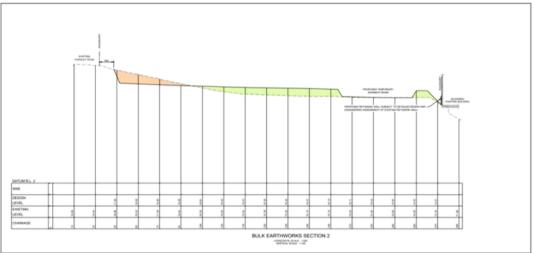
Site Section 2 (See Figure 5) Source: Craig & Rhodes
